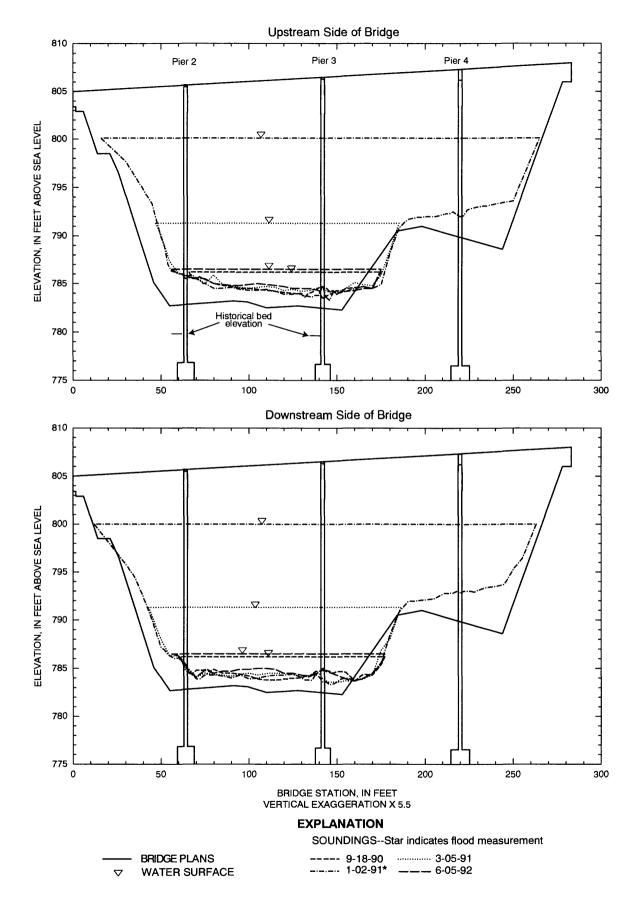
Cross sections showing bed elevations from bridge plans and soundings, State Road 101 over St. Joseph River at Saint Joe, Indiana.
